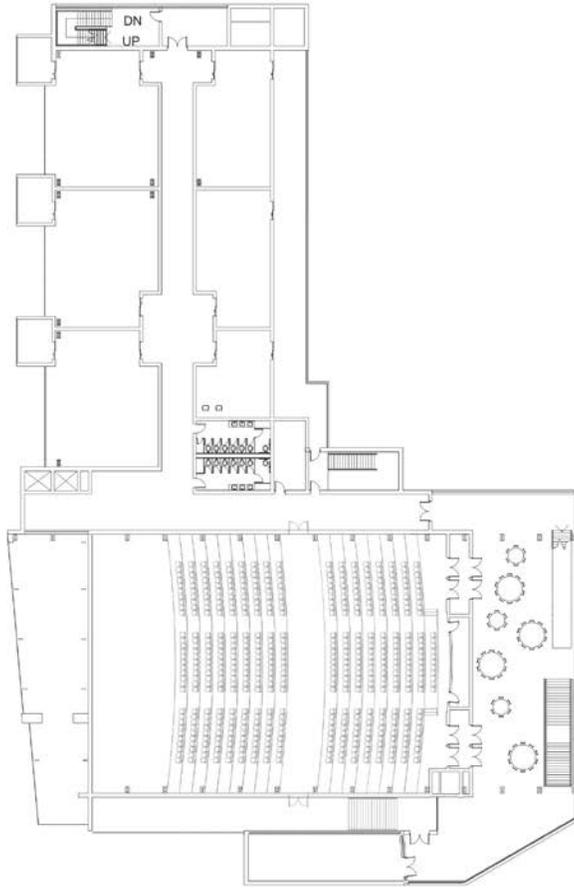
Third Floor (A 'Second Floor' only exists in stair landings because of height.)
